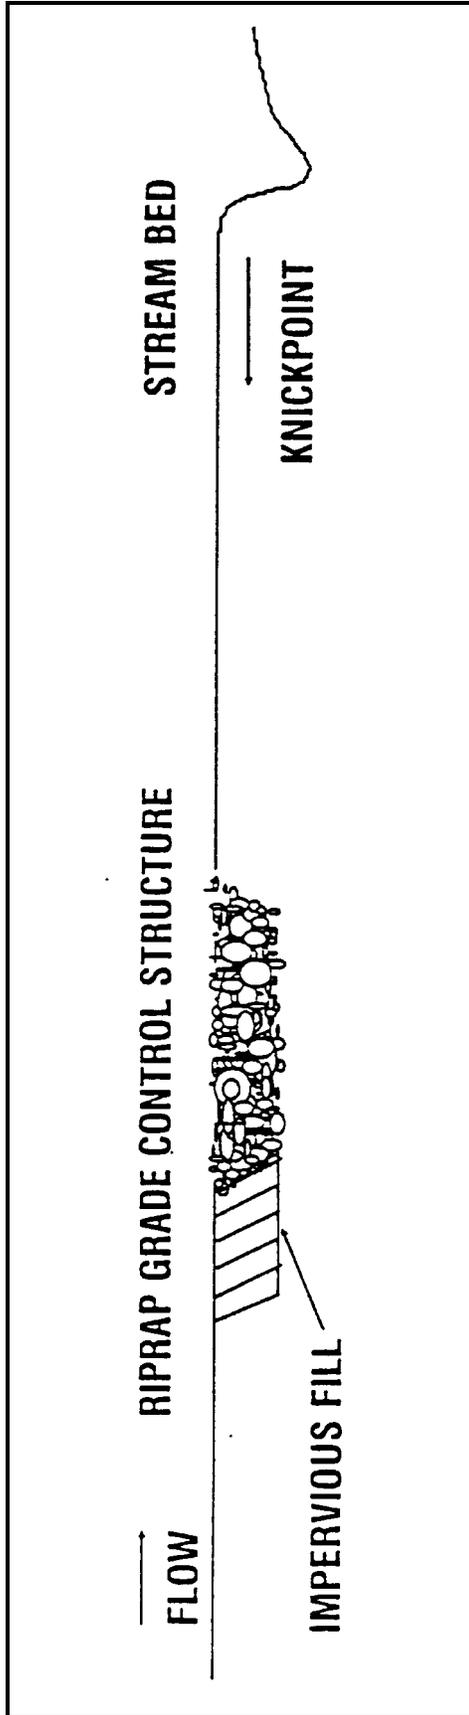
Channel Stabilization with Rock Sills (adapted from Whitaker and Jaggi, 1986)
